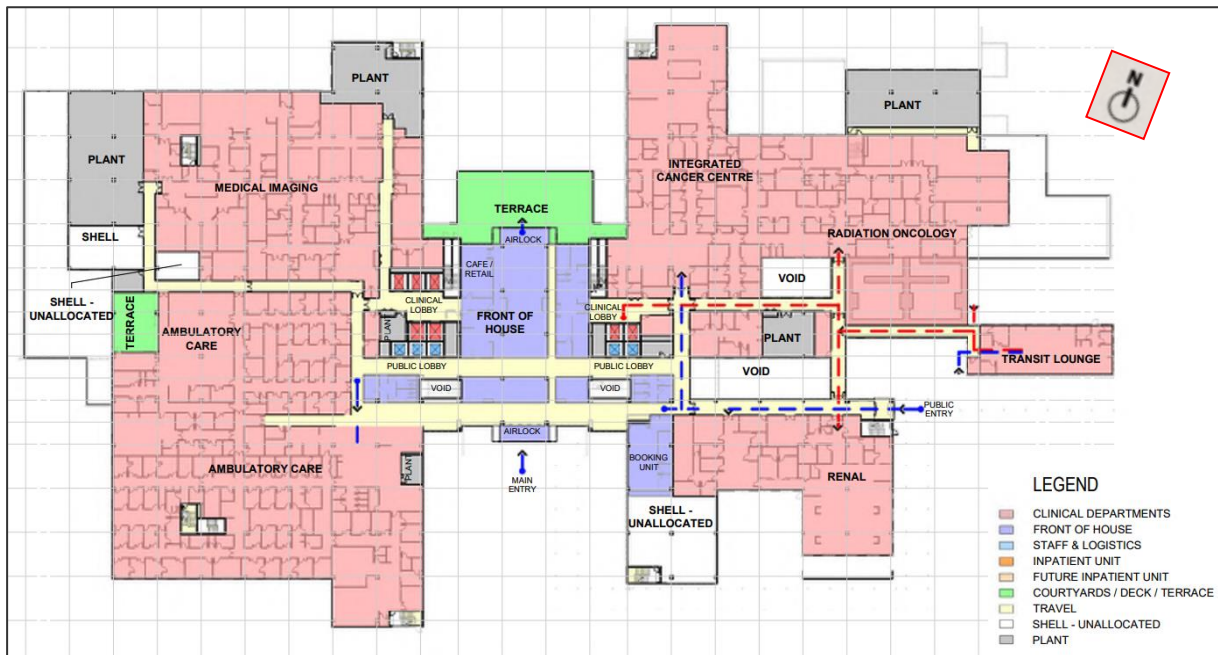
| Main Entrance Level / Ground Floor Level layout (Source: Applicant's RTS)
